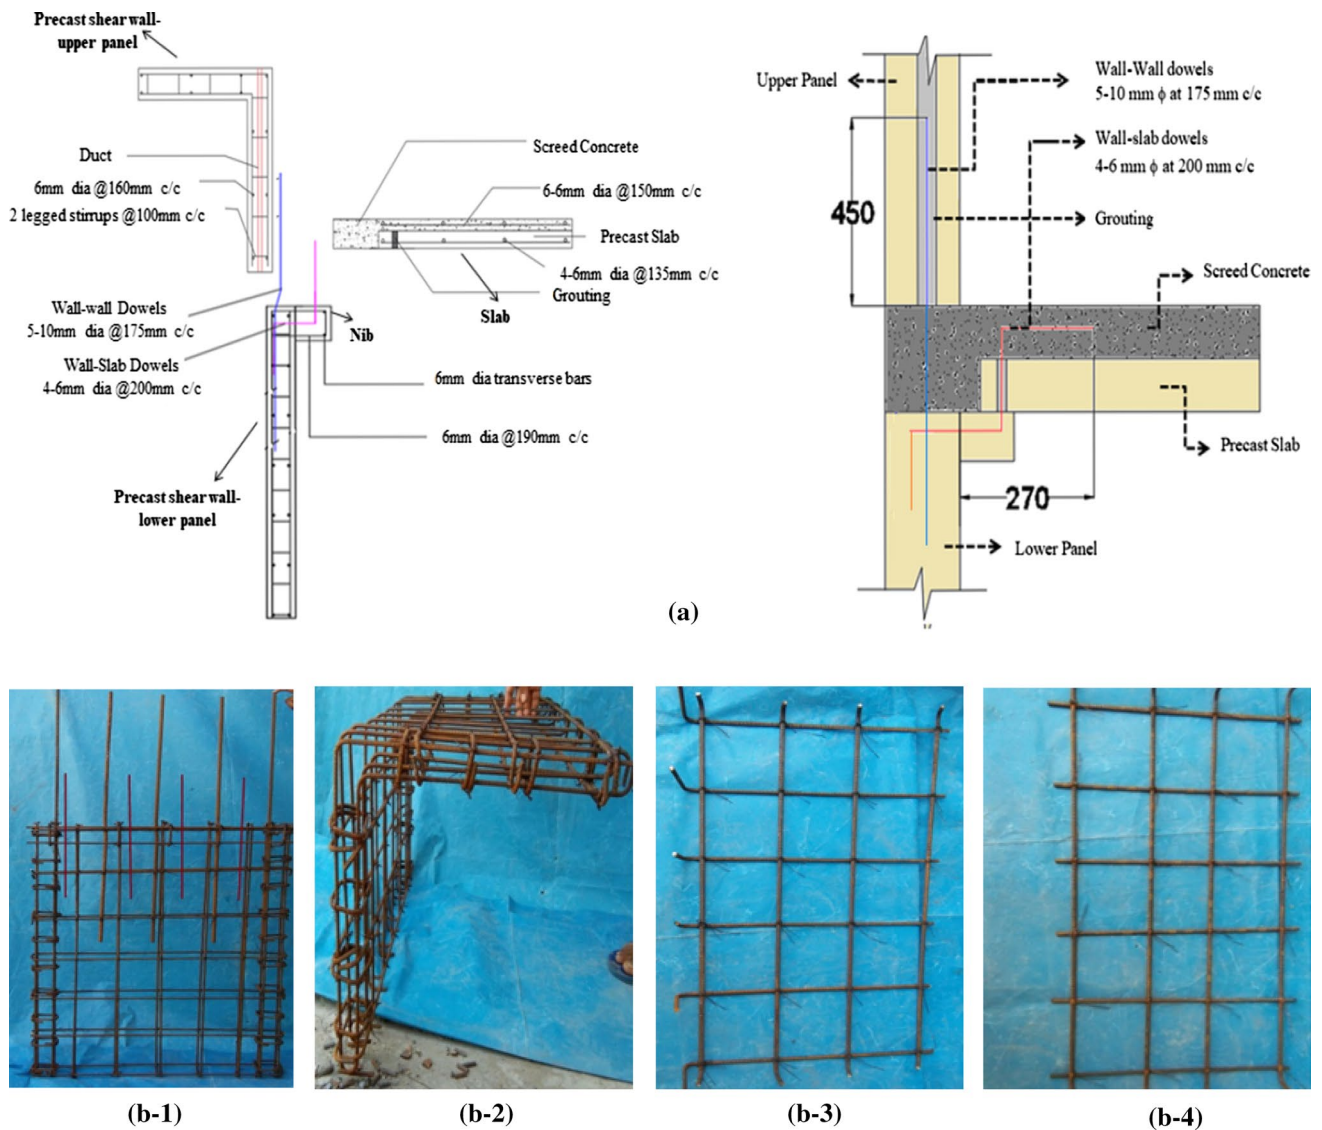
a Reinforcement and connection detailing. b Bar bending schedule (b-1) Precast shear wall-lower panel (b-2) Precast shear wall-upper panel (b-3) Precast slab (b-4) Screed reinforcement
